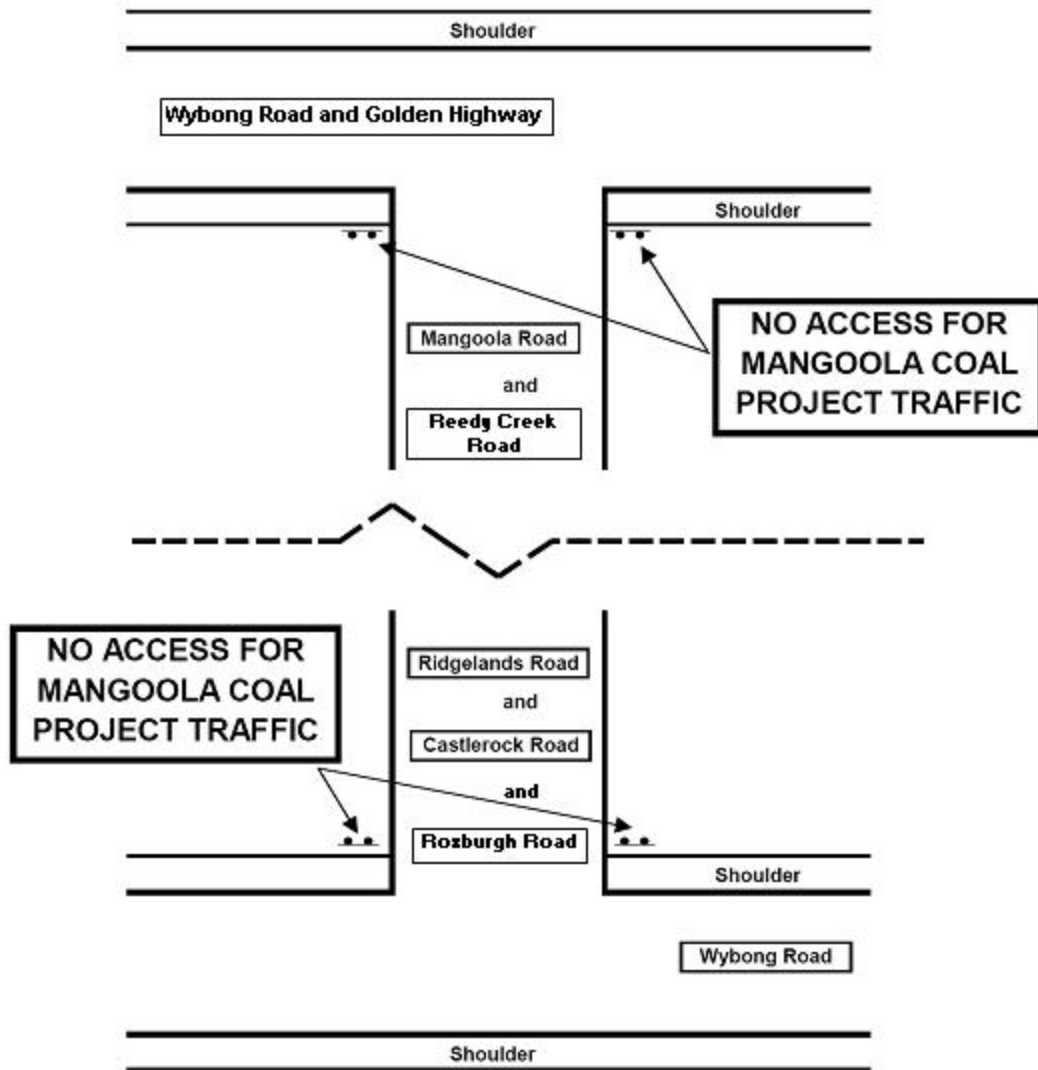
Existing (temporary) traffic signs to be retained at the side roads
